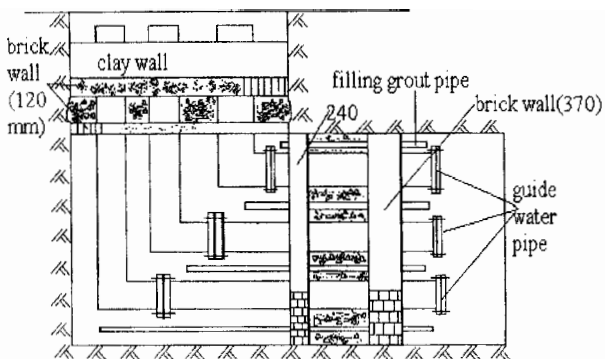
The diagram of construction of guide water pipe and concrete wall for No.1 suction well
